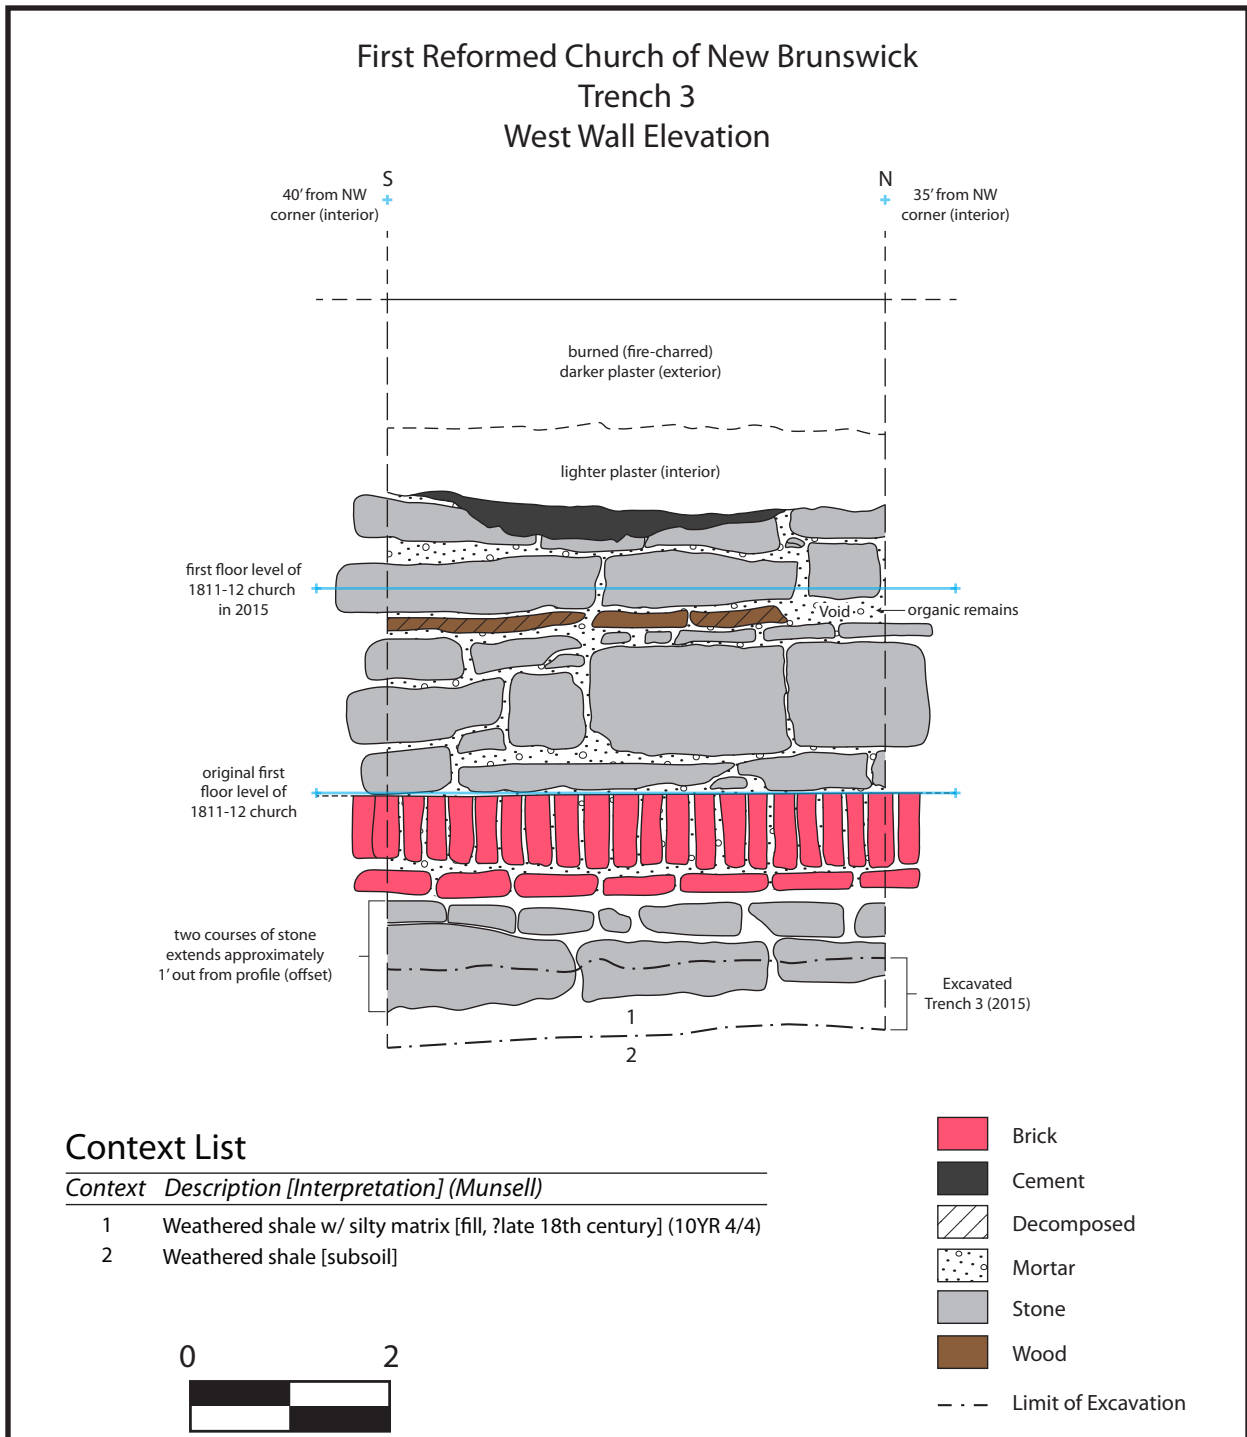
Church Interior, West Wall Elevation in Trench 3.
